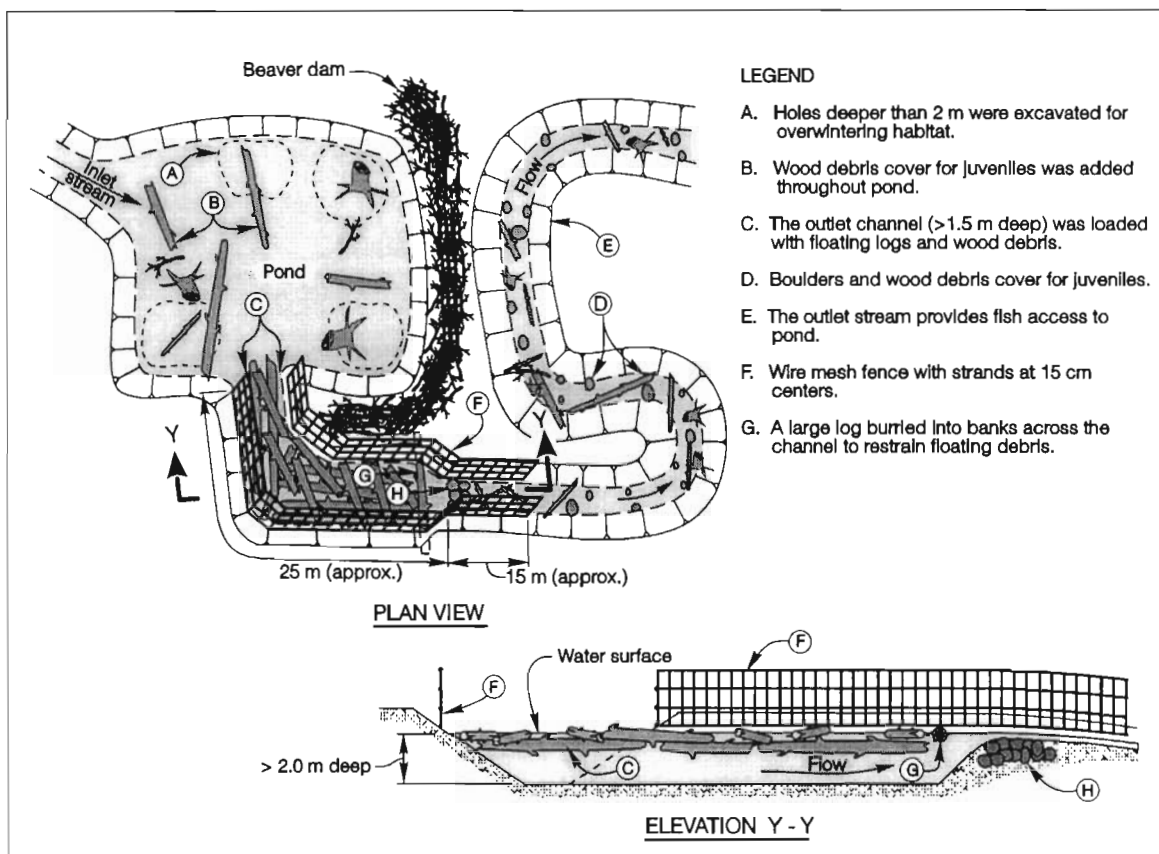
The Telkwa design concept. The outlet stream provides fish access into the beaver pond. Wire fence and floating logs restrict beaver access to the outlet stream.
